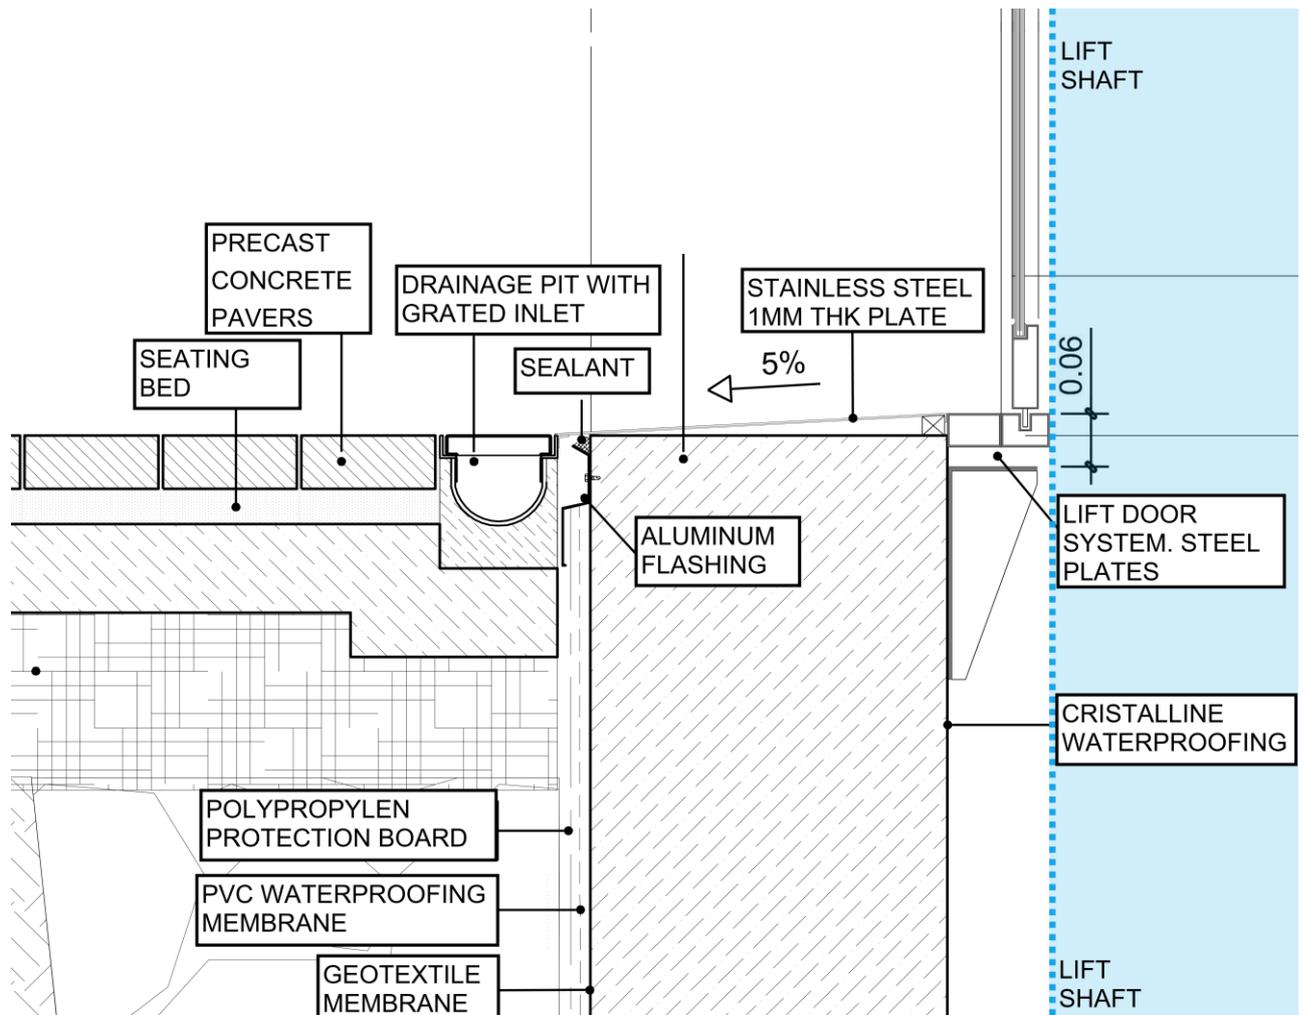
Waterproofing lift detail example that will be adapted to the details of the project
